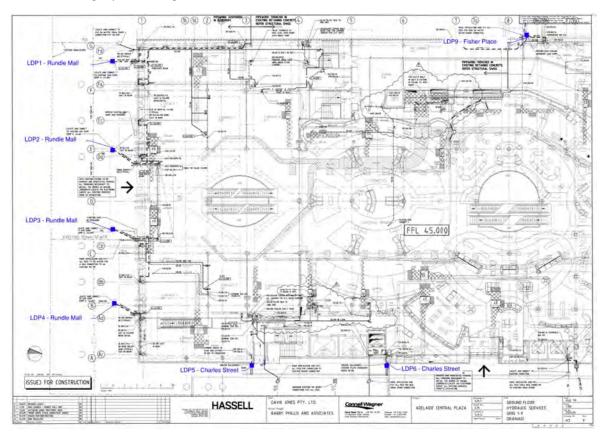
IFC Hydraulic Drawing with Existing LPD Locations Markup - Southern Portion of the Retail Building
